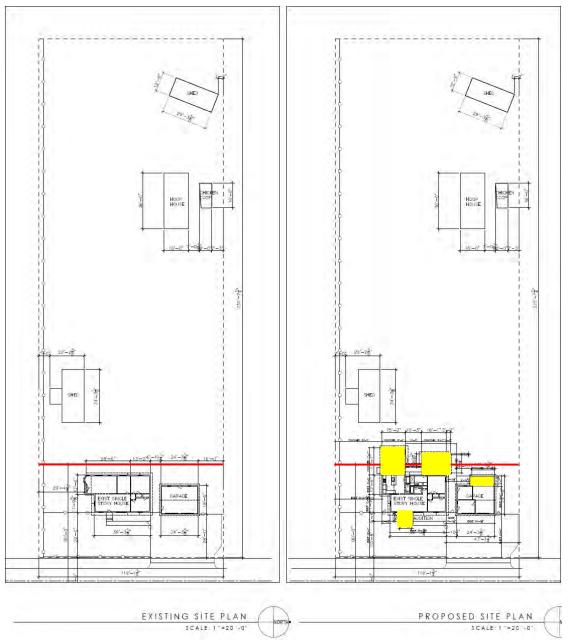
Site Plans showing existing and proposed improvements, supplemental setback boundary indicated by red line. Proposed additions are indicated by yellow boxes
